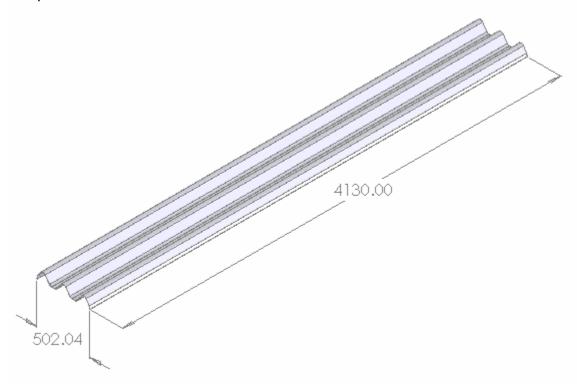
Thrie Beam Rail: Isometric View (dimensions in millimeters)
